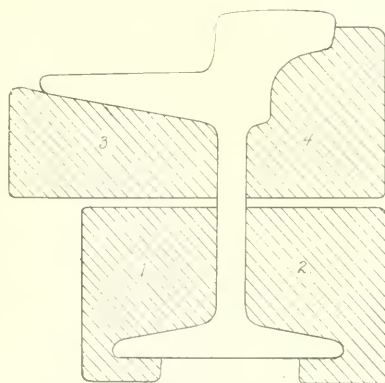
LUGS WELDED TO THE RAILS.
